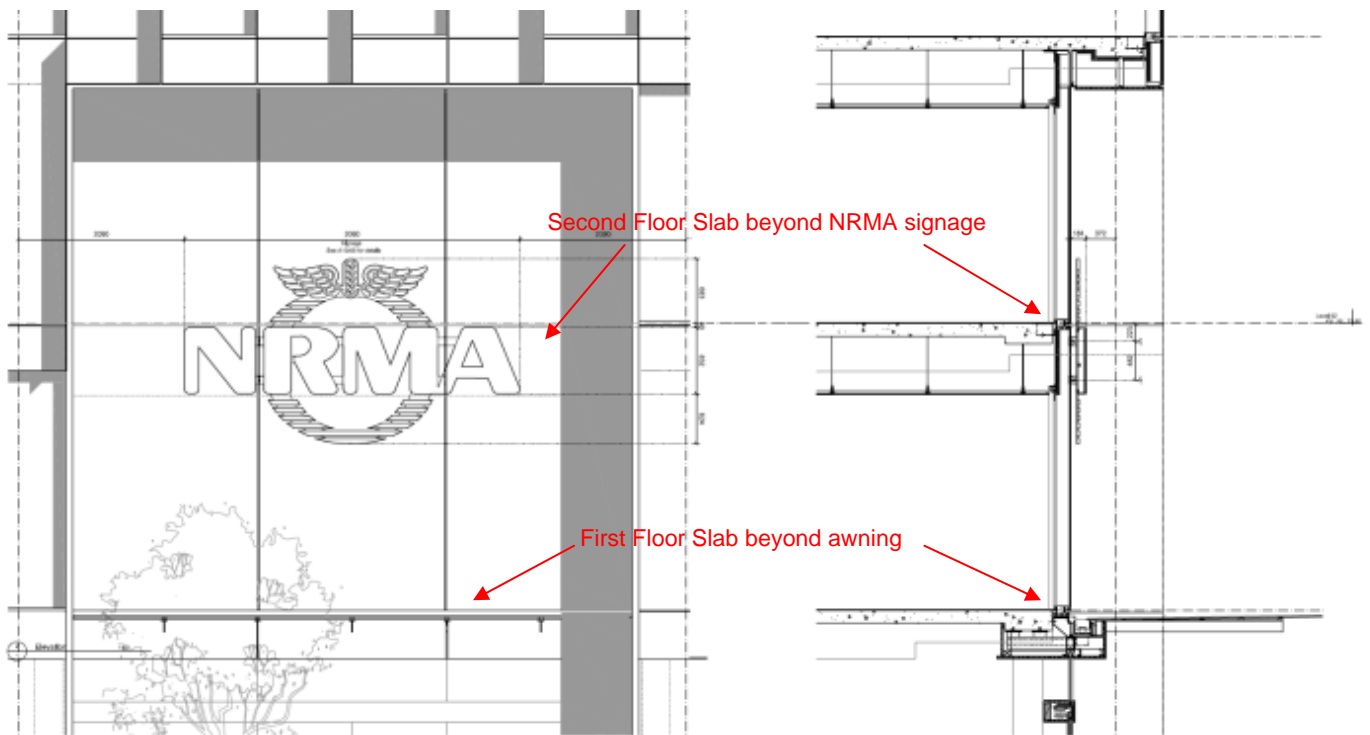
Elevation and Section of Proposed Portico (including indicative NRMA signage)
